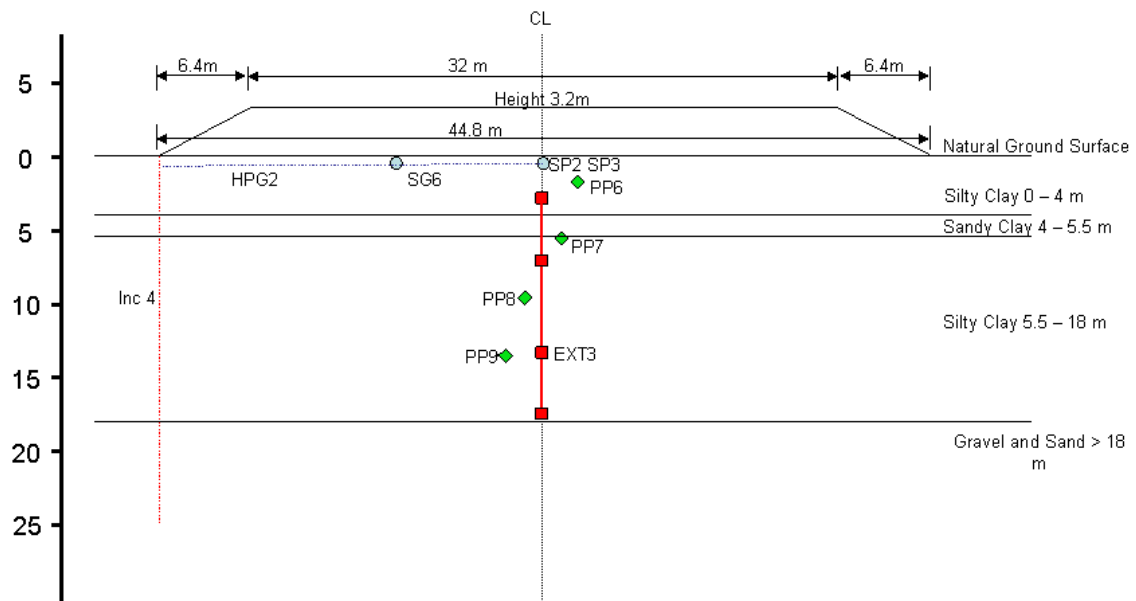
Embankment B CH950 – CH1107: Cross Section Showing Instrumentation
